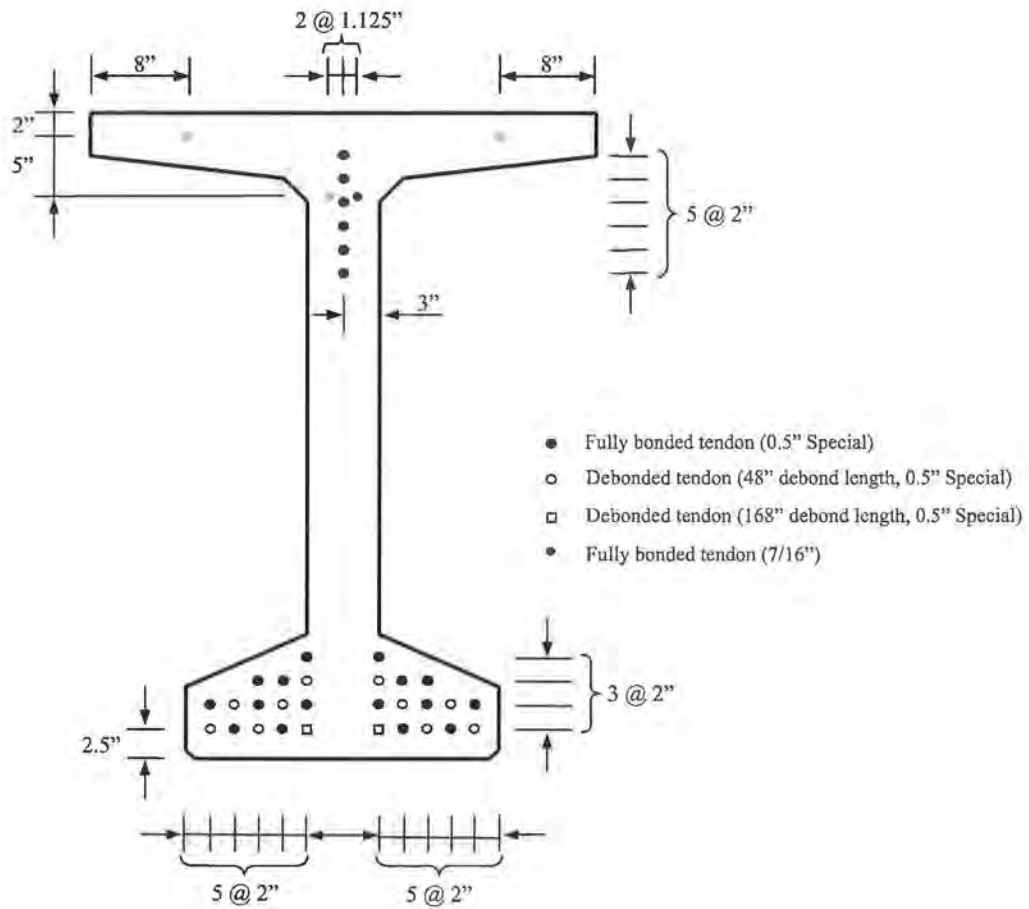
Cross-sectional Prestressing Tendon Profile at Girder End
